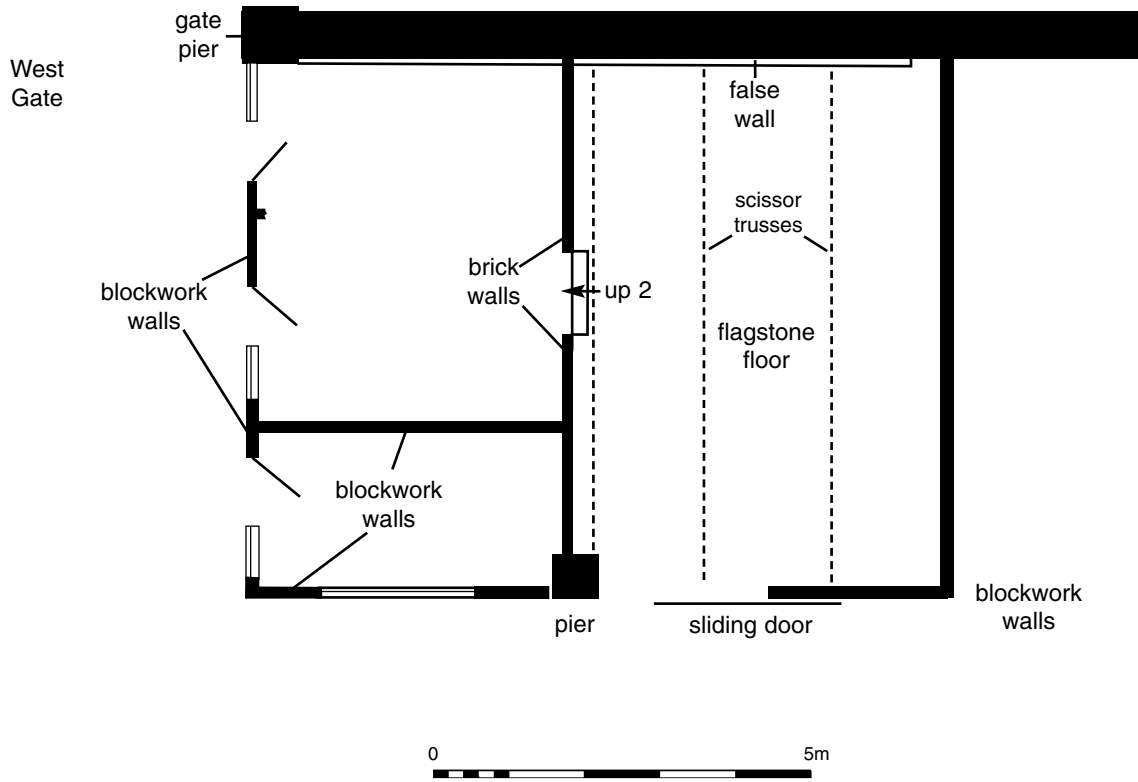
Floor plan of the block north of the west gate, scale 1:100
